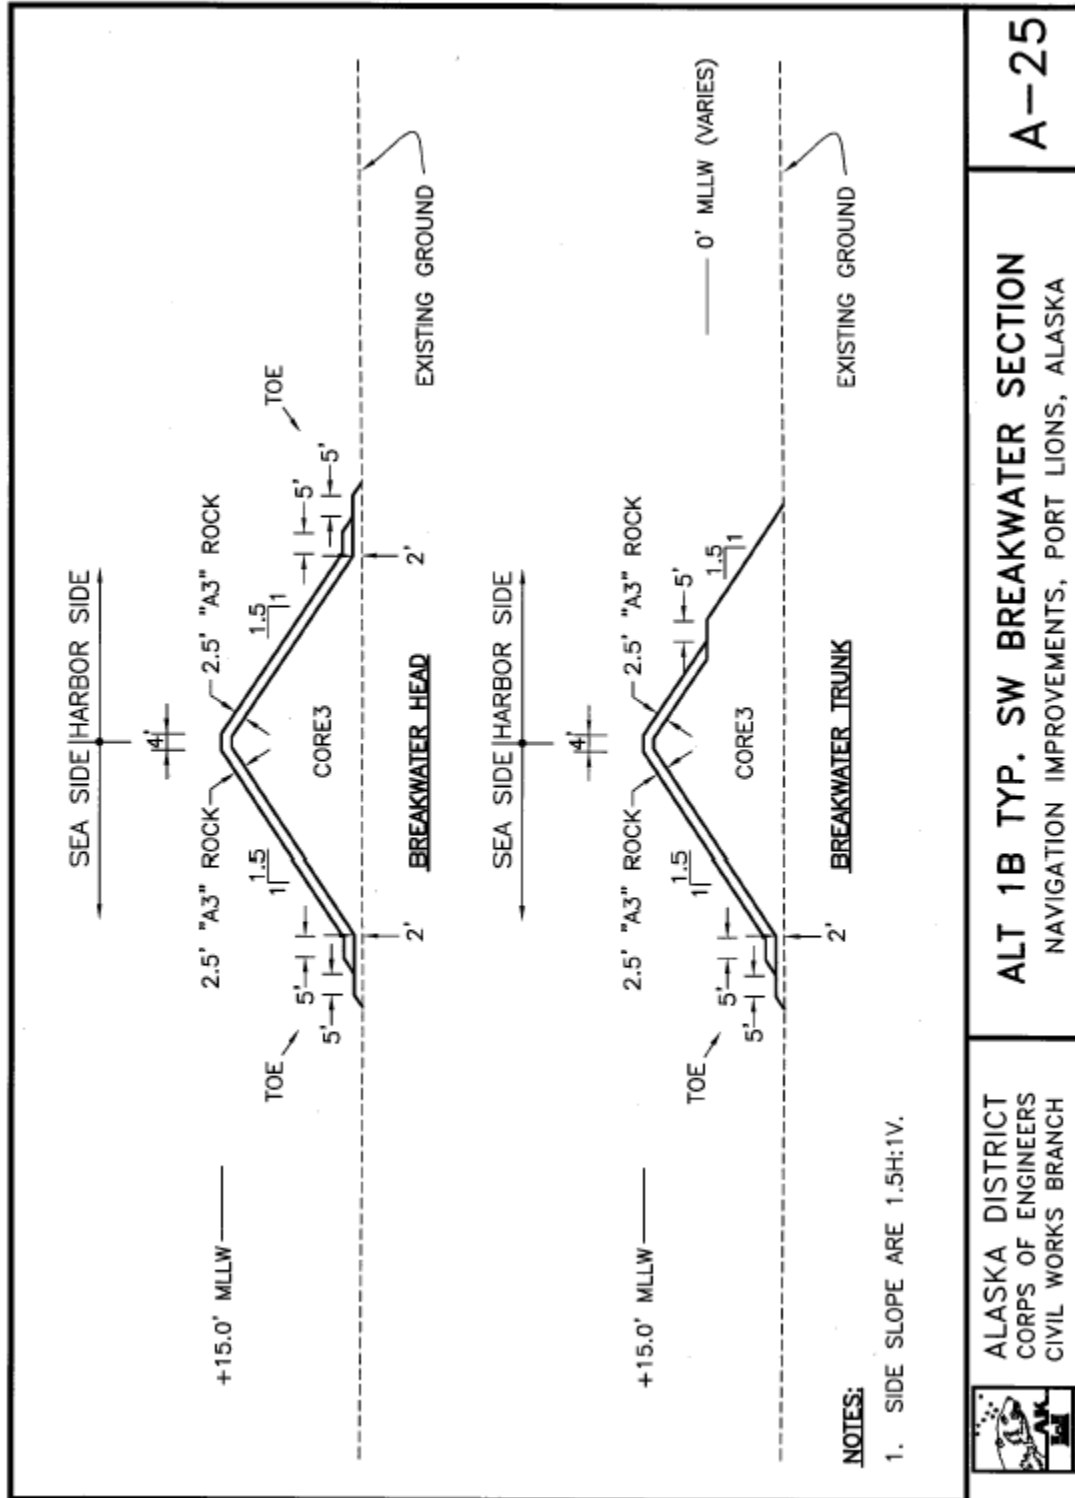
Alternative 1B Typical SW Breakwater Cross-Section
